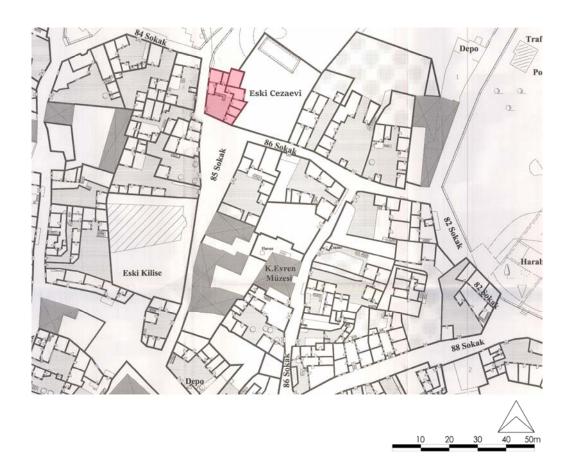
The site plan of Kaçıklar House. (Source: Saf, 2004)
